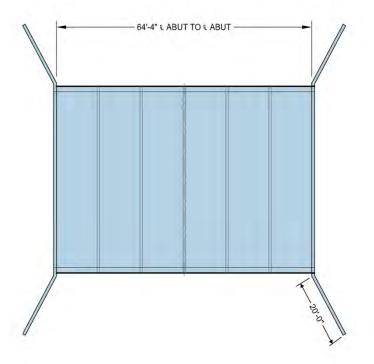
EI.24.11- 2: Plan view of a multi-cell reinforced concrete culvert.
